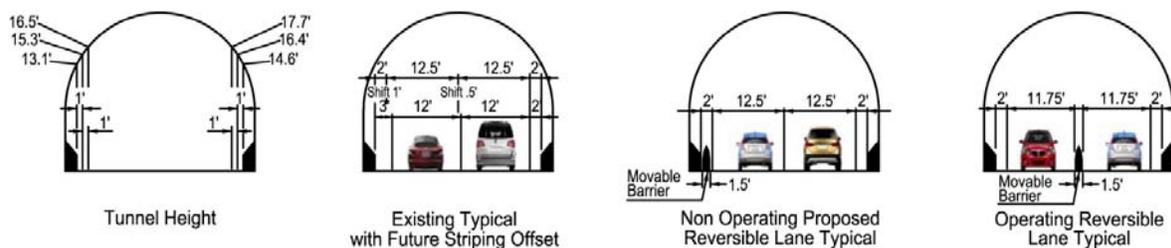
Typical Westbound I-70 Cross Sections (Reversible Lane Corridor)
